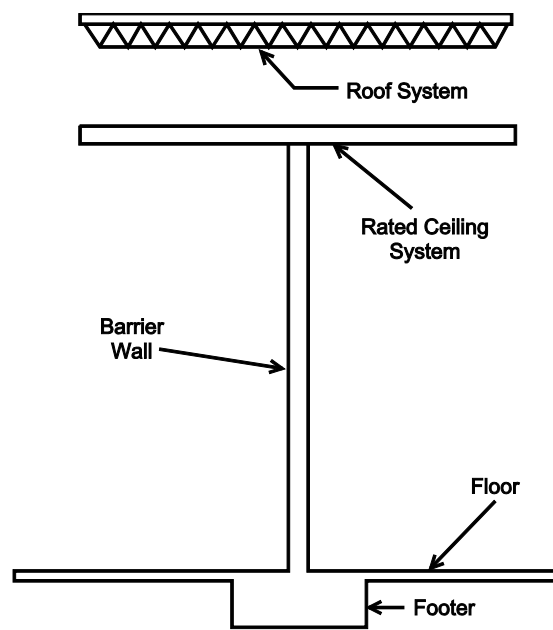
Fire Barrier From Floor To Rated Ceiling.
